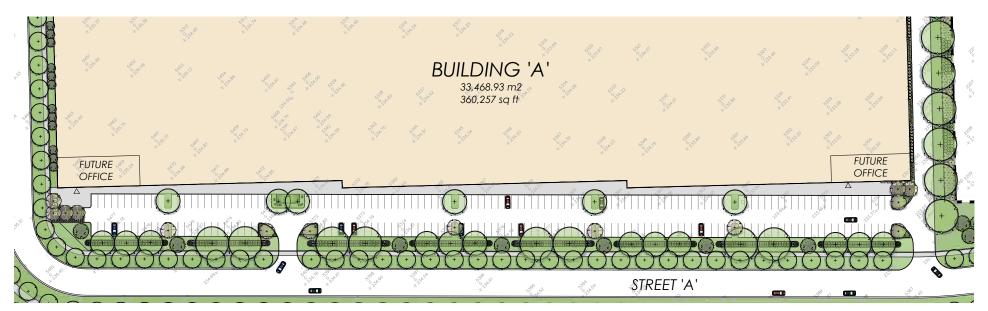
Landscape Strip and Street Tree Planting along Building 'A' by Adesso Design Inc.
